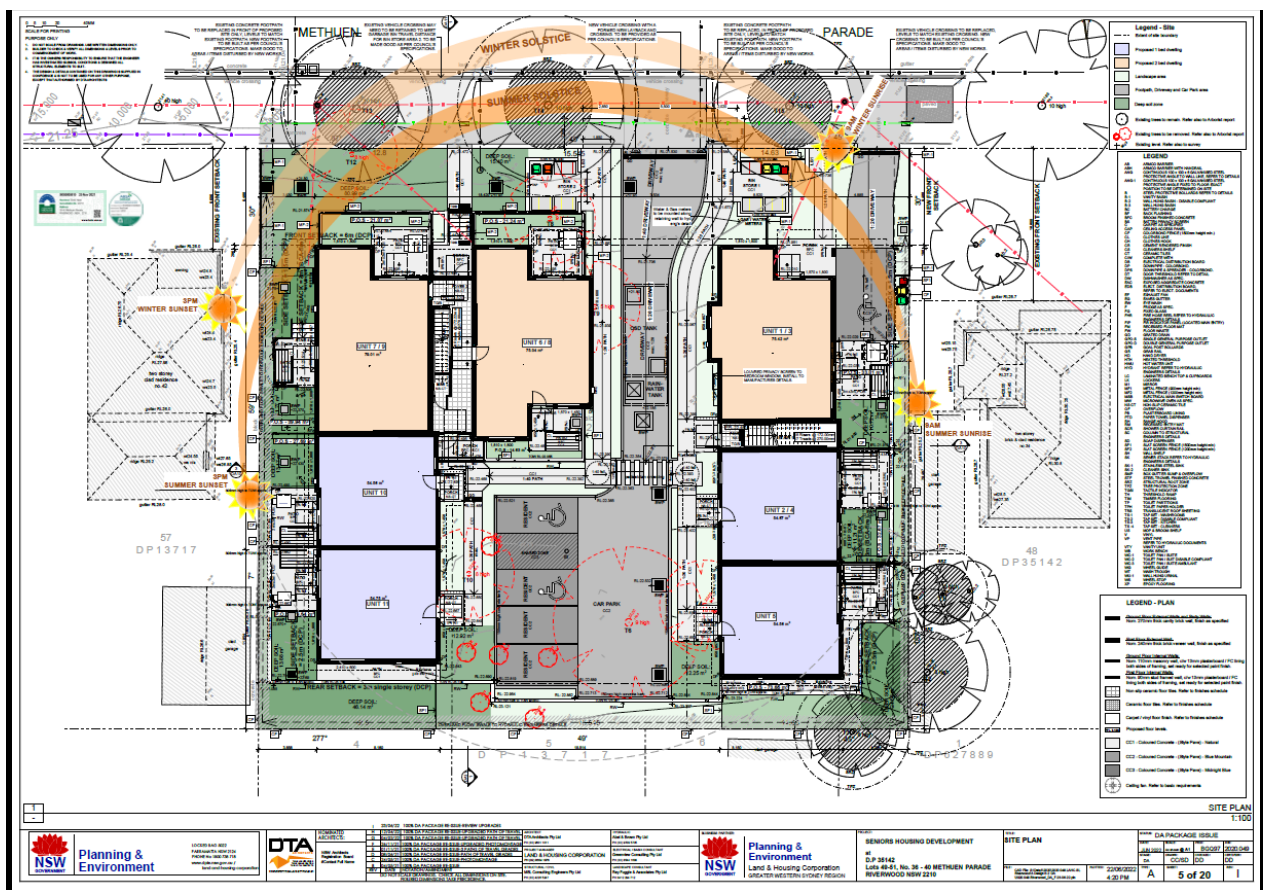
Proposed Ground Floor Plan (Source DTA Architects)
